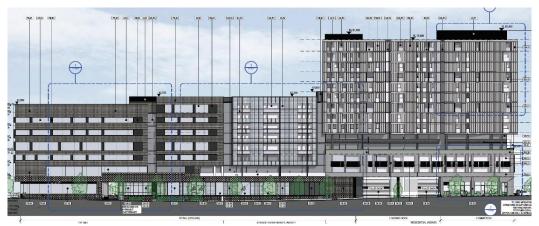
Previous approved amendment Heidelberg Road (north) elevation
